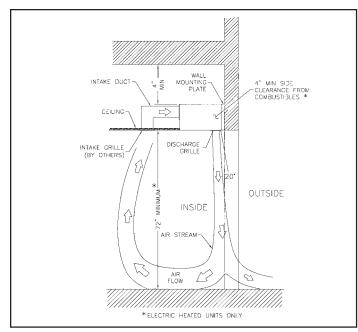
In-Ceiling Mount With Optional Wall Plate
